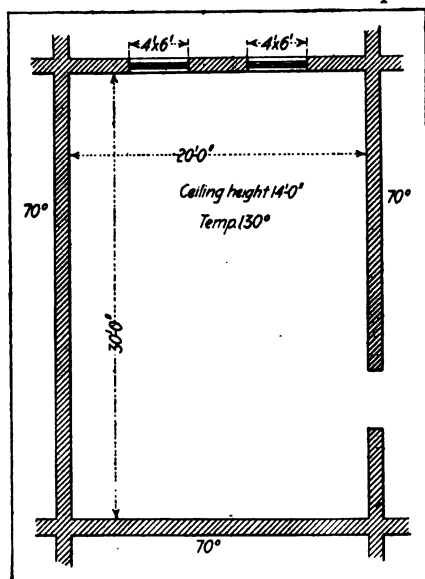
PLAN OF ROOM TO SHOW APPLICATION OF RULES
